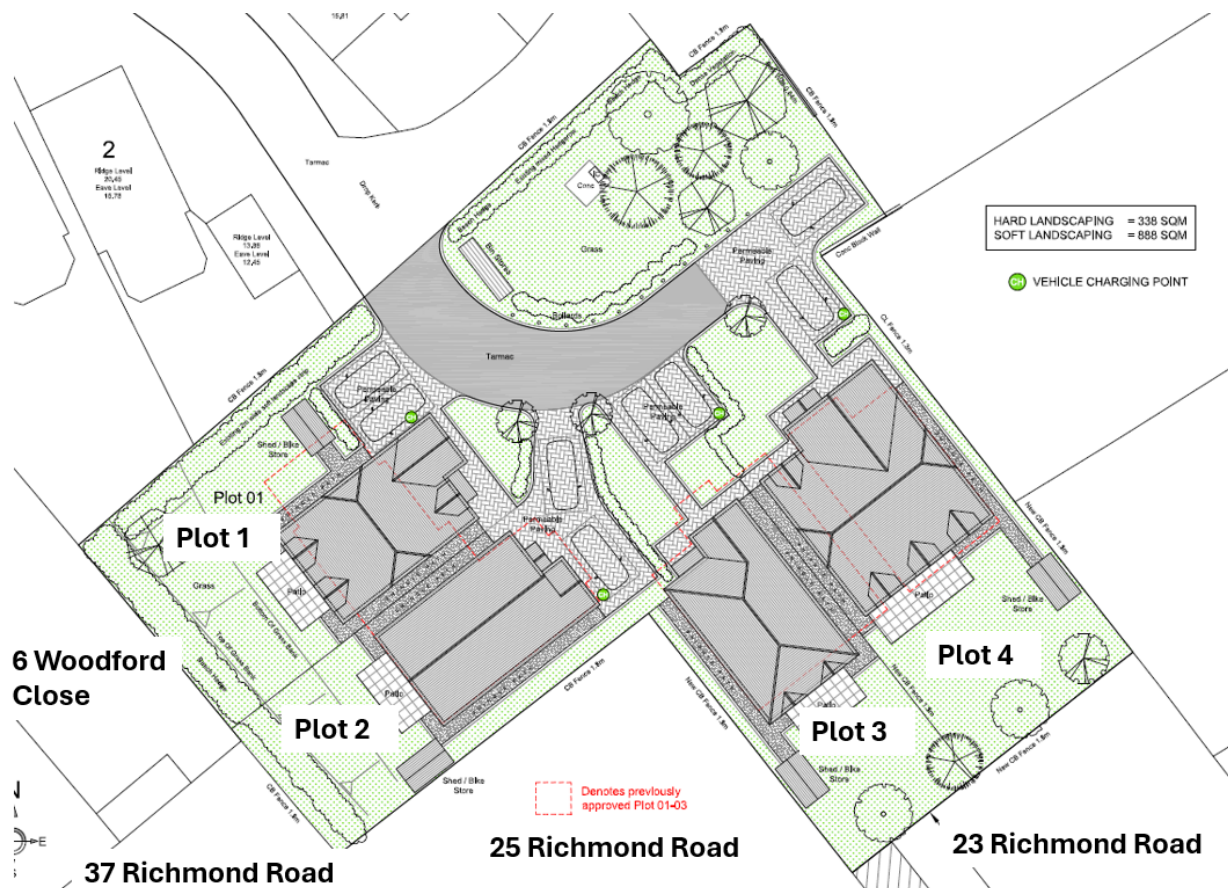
Proposed Site Plan (as amended 2 May 2025)
